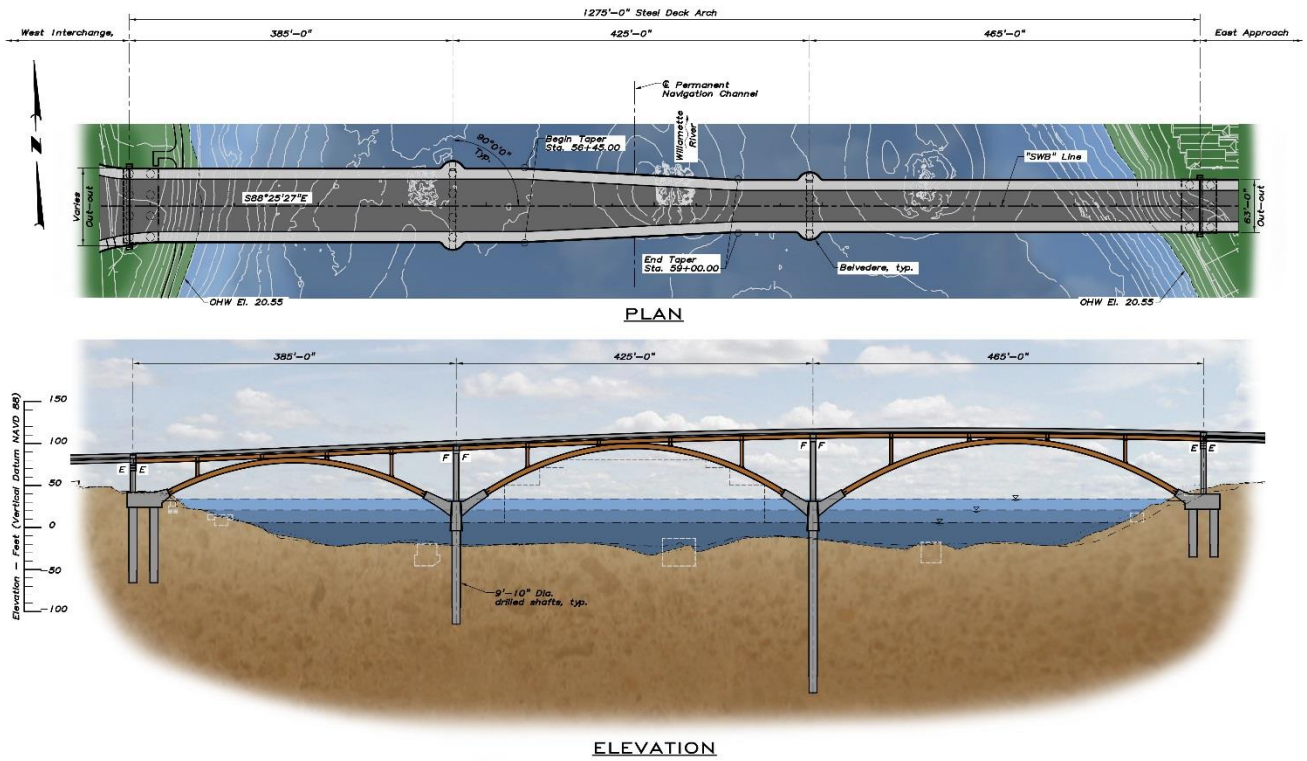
Plan and Elevation Views of Three Span Steel Deck Arch
